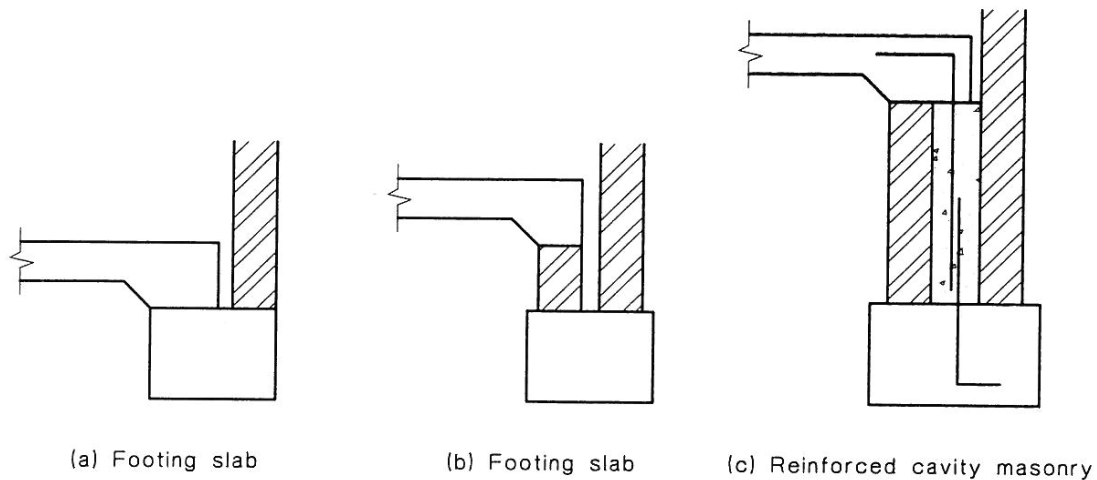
EXAMPLES OF FOOTING SYSTEMS REQUIRING JOINT TREATMENT
